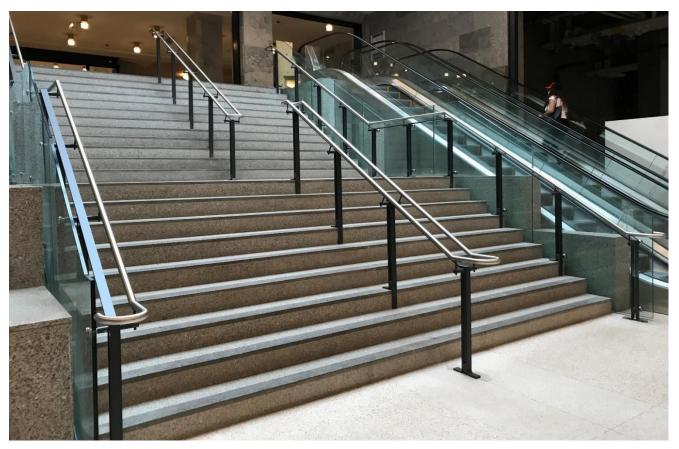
Example of existing stairs leading to the concourse level in the vicinity of proposed 'Stair N'. The design and materials of existing new stairs within the Union Station Headhouse should guide the design of stairs to be added as part of the WELRT project
